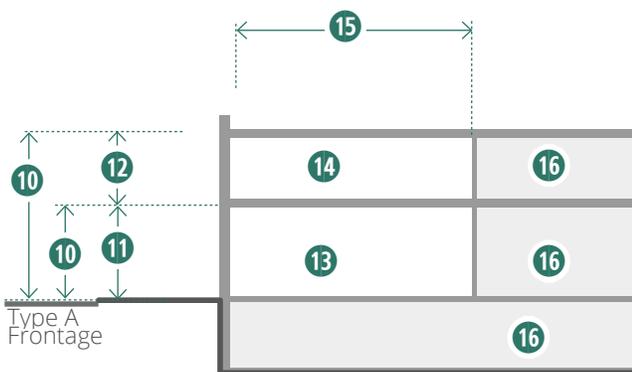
(5). Commercial Storefront Building Plan: Building Siting Requirements
